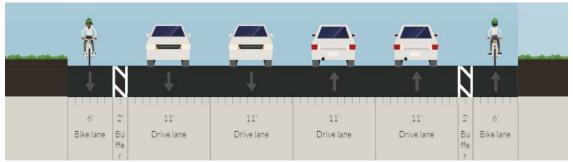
Recommended cross section of Allens Avenue north of Ernest Street outlined in Option B. Option B would create buffer zones to improve safety north of Ellenfield/Ernest Street
